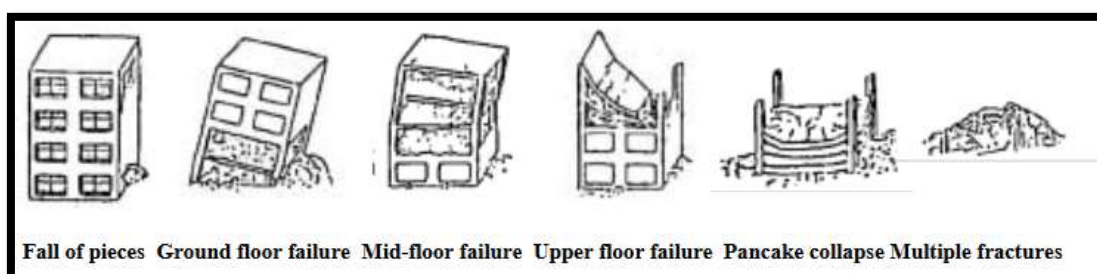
Typical damage pattern of reinforced concrete with moment-resisting concrete frame buildings
